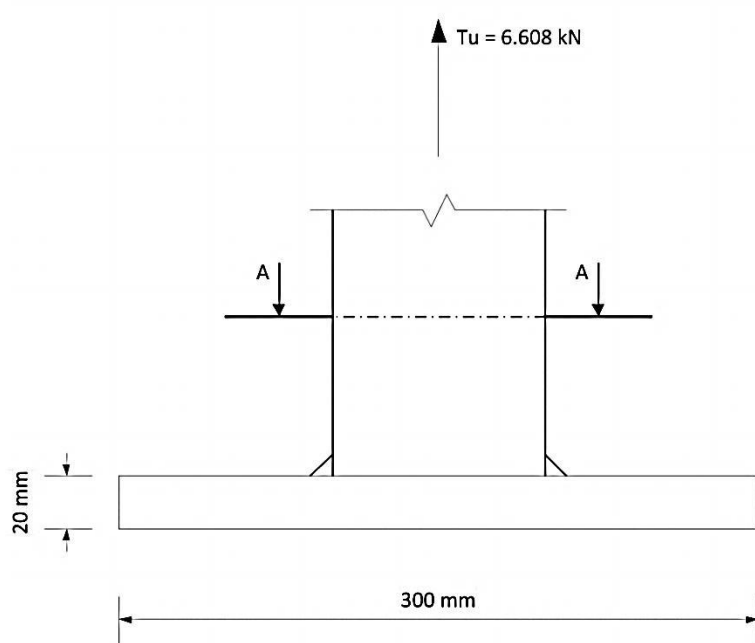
Longitudinal side view of the welds of the base plate.
